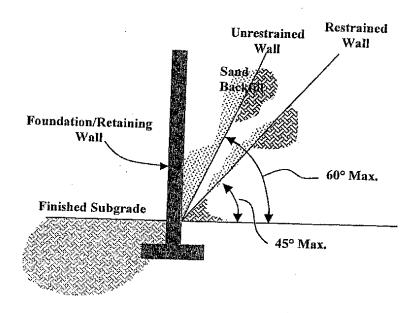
Required Area for Sand Placed Behind Basement-Type and Retaining Walls
